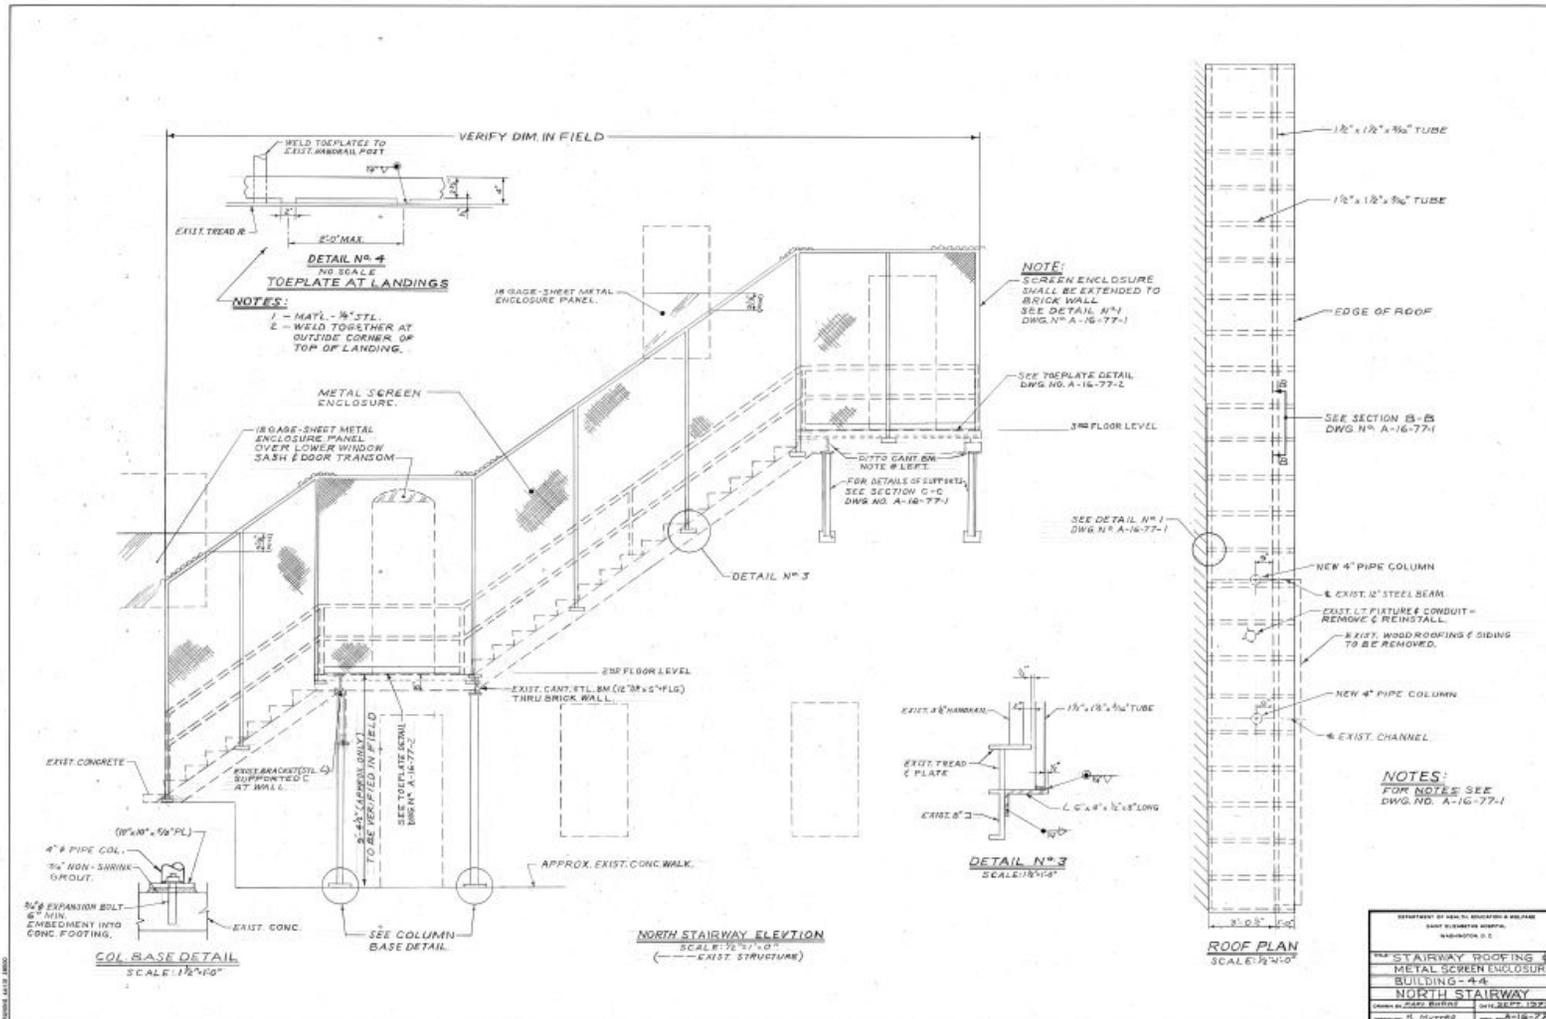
Construction drawings for the enclosure around the exterior stairway, 1977. A similar enclosure was added to the south stairway at the same time, as well as a ladder from the third floor stair landing to the roof. Source: GSA archives, image DC1458SE0100. See also GSA archives, image DC1458SE0101.
